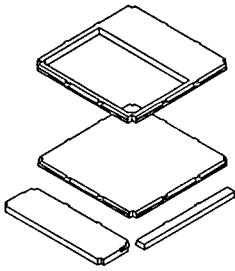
Floor slabs, cantilever slabs and edge girders
